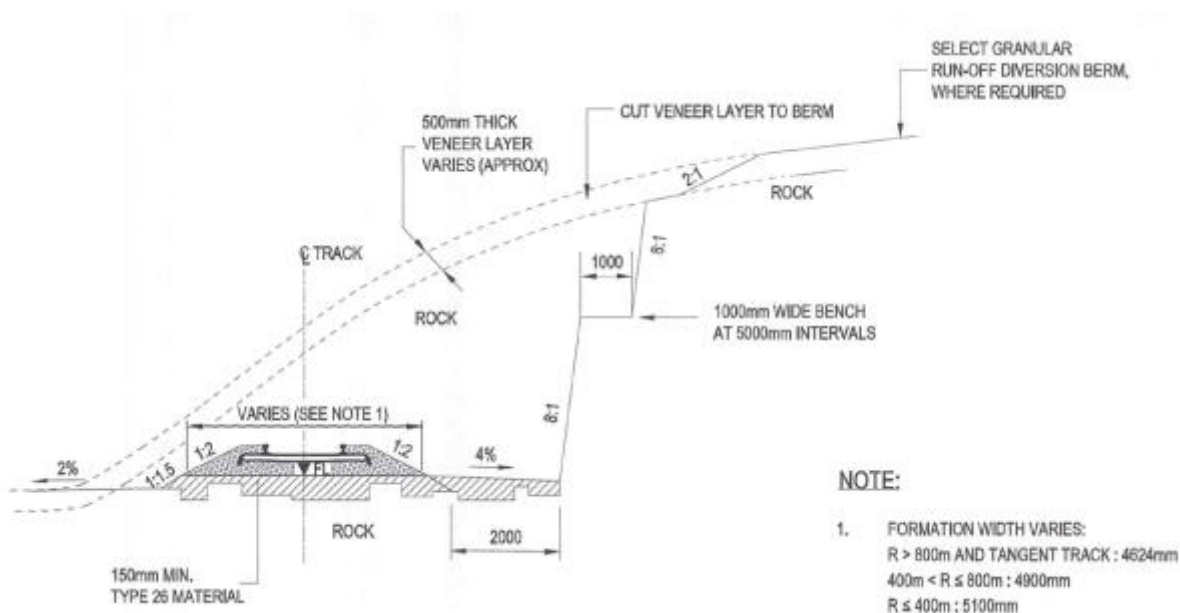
Typical Cross Section of Railway Embankment – Section I
